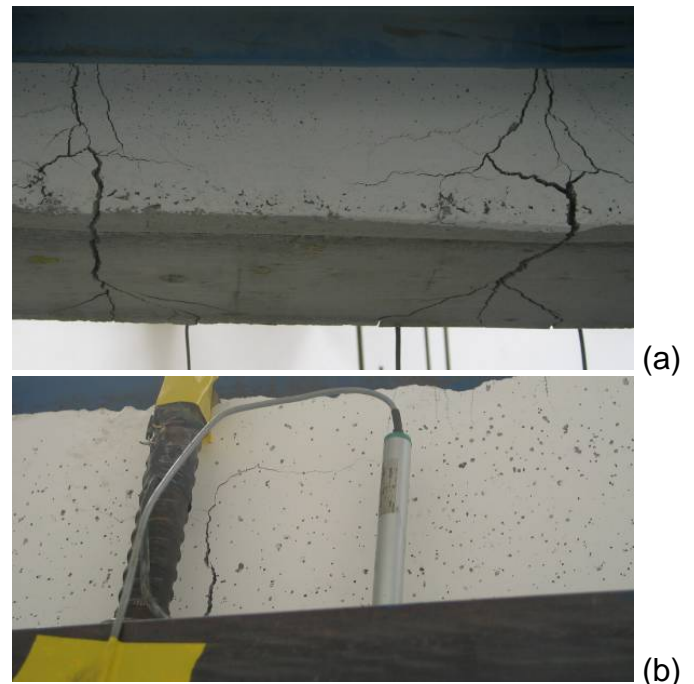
Un-reinforced beam: cracks distribution close to the collapse: a) bottom side; b) upper side.
